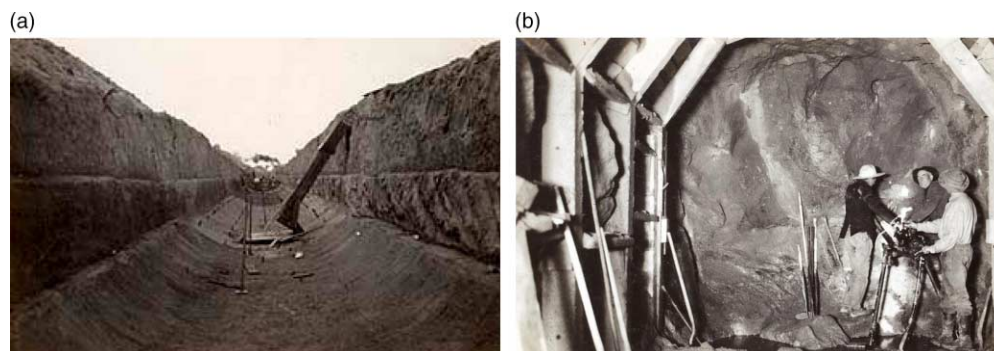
| First Los Angeles Aqueduct: (a) construction of a box conduit north and east of San Andreas Fault; (b) construction of Elizabeth tunnel passing through the San Andreas Fault. The full colour version of all figures in this paper can be accessed by subscribers online at <http://www.iwaponline.com/jws/toc.htm>
